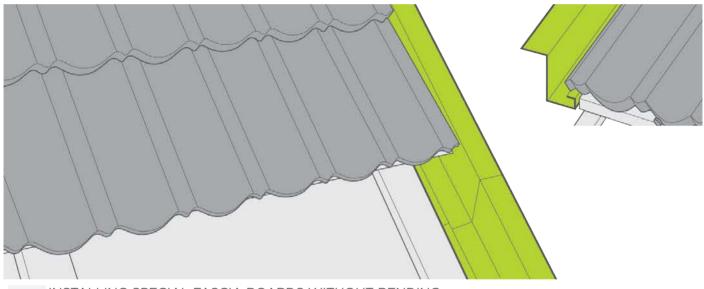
INSTALLING SPECIAL FASCIA BOARDS WITHOUT BENDING
